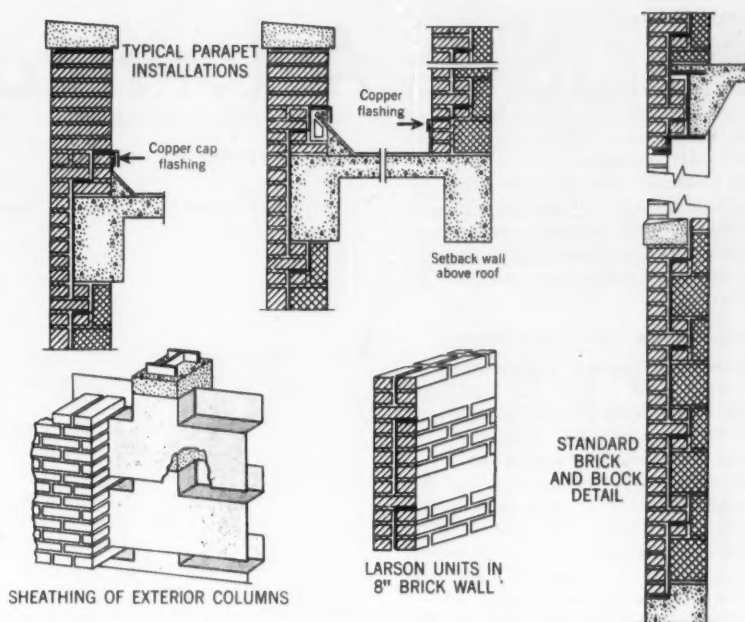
Proper methods of waterproofing for brick and masonry walls at time of construction, by means of pre-formed units, are shown.
